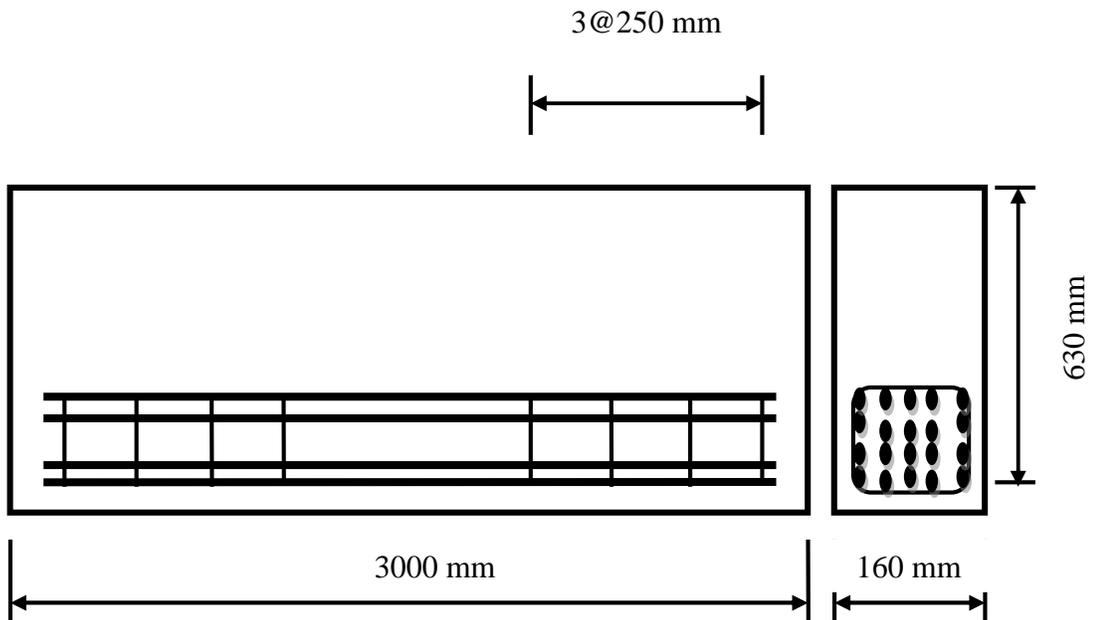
Longitudinal and Cross-Section of the Mangrove Reinforced Concrete
